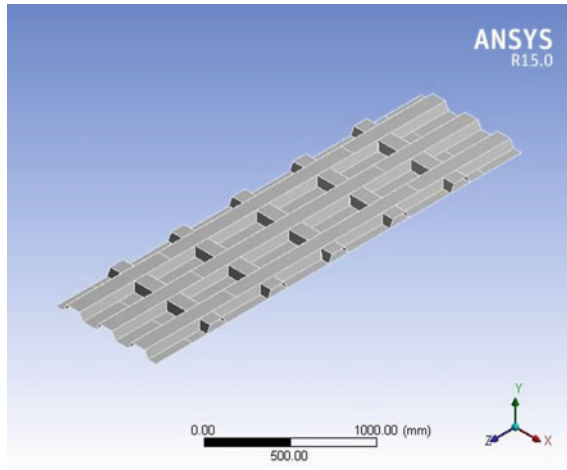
Arrangement of corrugated metal deck slab with 5 stiffeners
